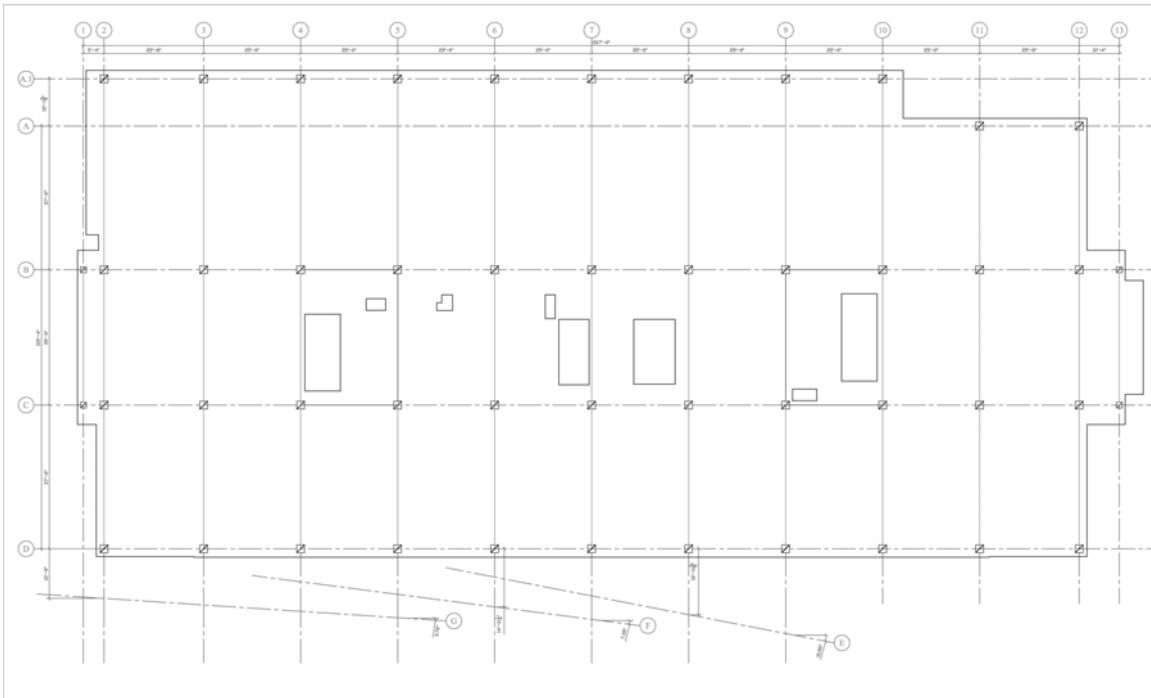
4<sup>th</sup> Floor Plan – Concrete
